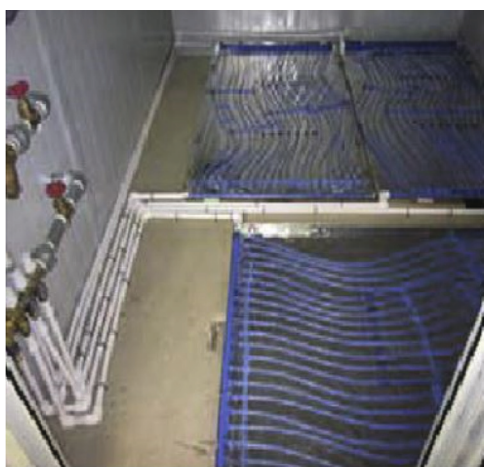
Structure of floor system with PCM pipe immersed in concrete layer [125].
